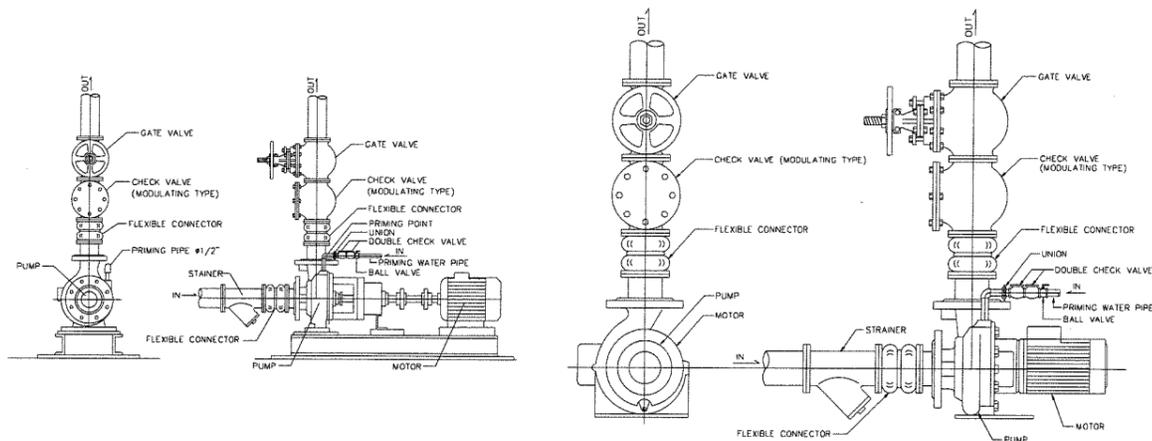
DETAIL OF HORIZONTAL BOOSTER PUMP SET
